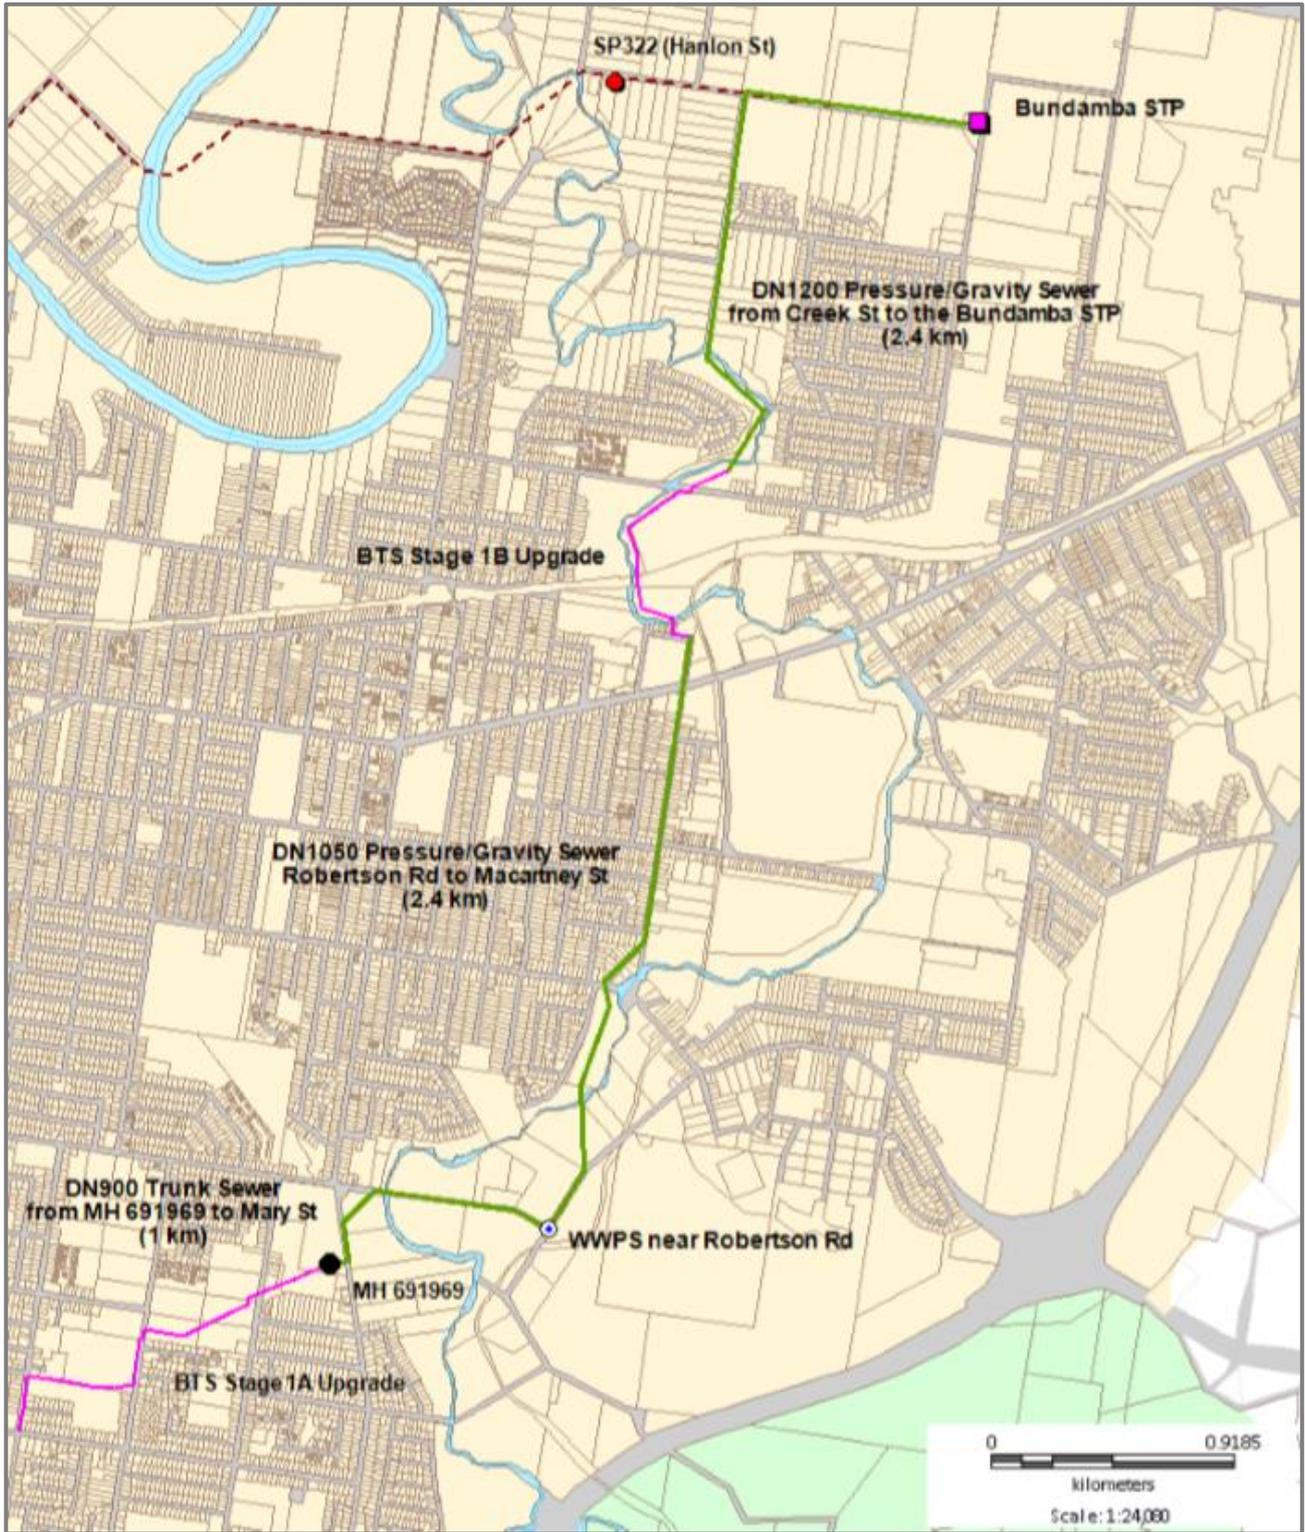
Layout plan of the proposed BTS augmentation from Wastewater Master Plan for Bundamba-Tivoli 2013
